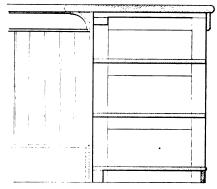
A Simple Design for Plain Work—Elevation and Section of a Counter that Can Be Bullt of Ordinary Stock.
